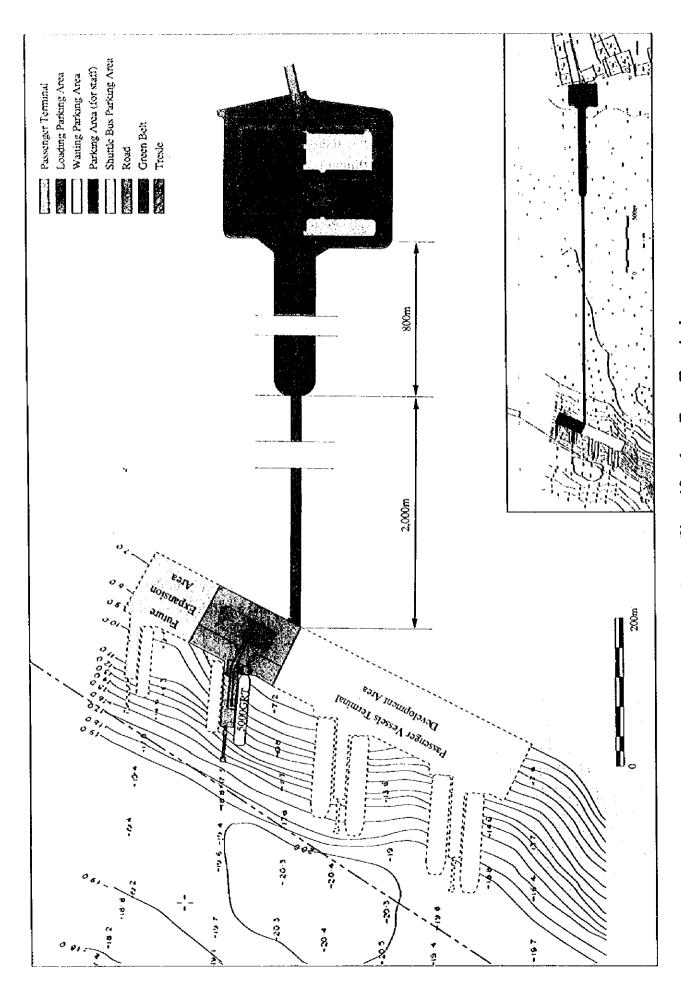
Layout Plan of Surabaya Ferry Terminal
